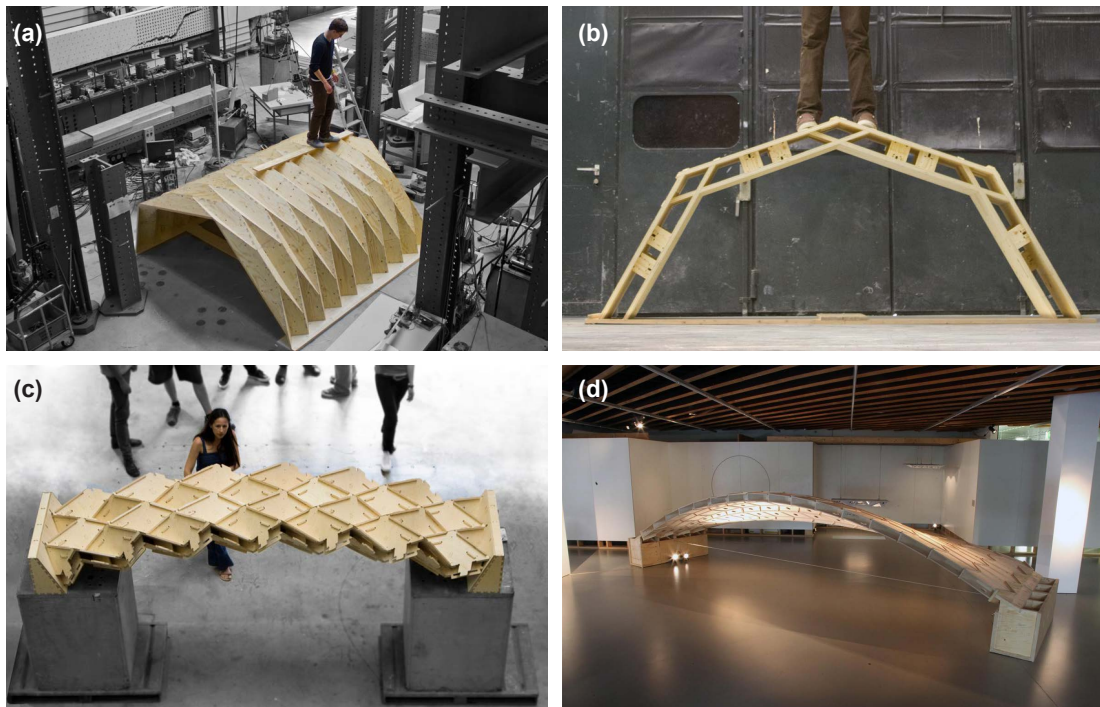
Evolution of IBOIS prototypes: (a) Single-layered origami prototype using MTSJ [123] / (b) Double-layered prototype using snap-fit joints [121] / (c) Double-layered Miura-Ori pattern prototype using TT [126] / (d) Double-layered free-form shell prototype using TT [120].
